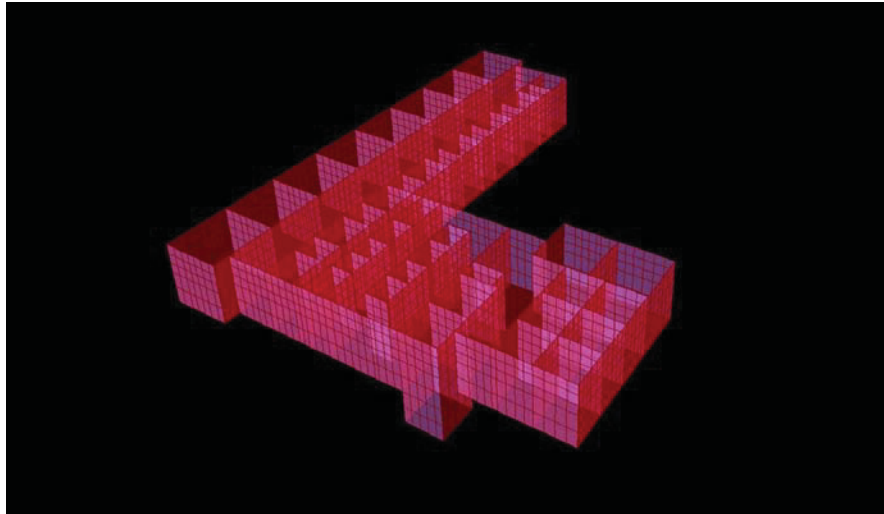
View of Below Grade Sections in the Design Model
